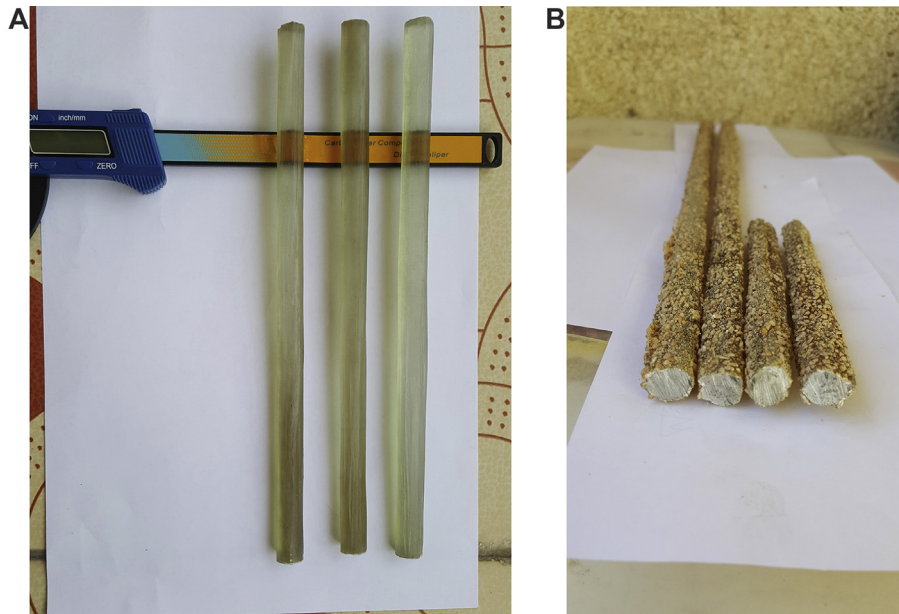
GFRP specimens. (A) GFRP only, (B) Sand coated GFRP.
